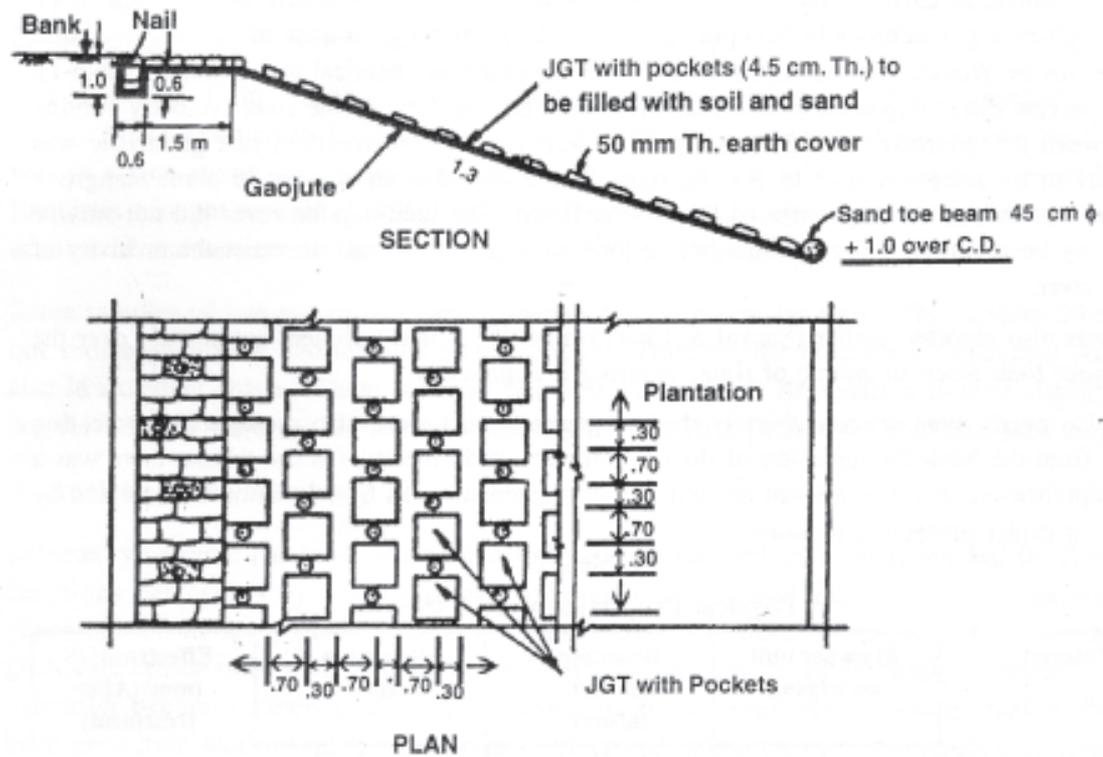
Typical Sectional Elevation & Plan for bank protection & mangrove plantation (JGT with pocket type)
